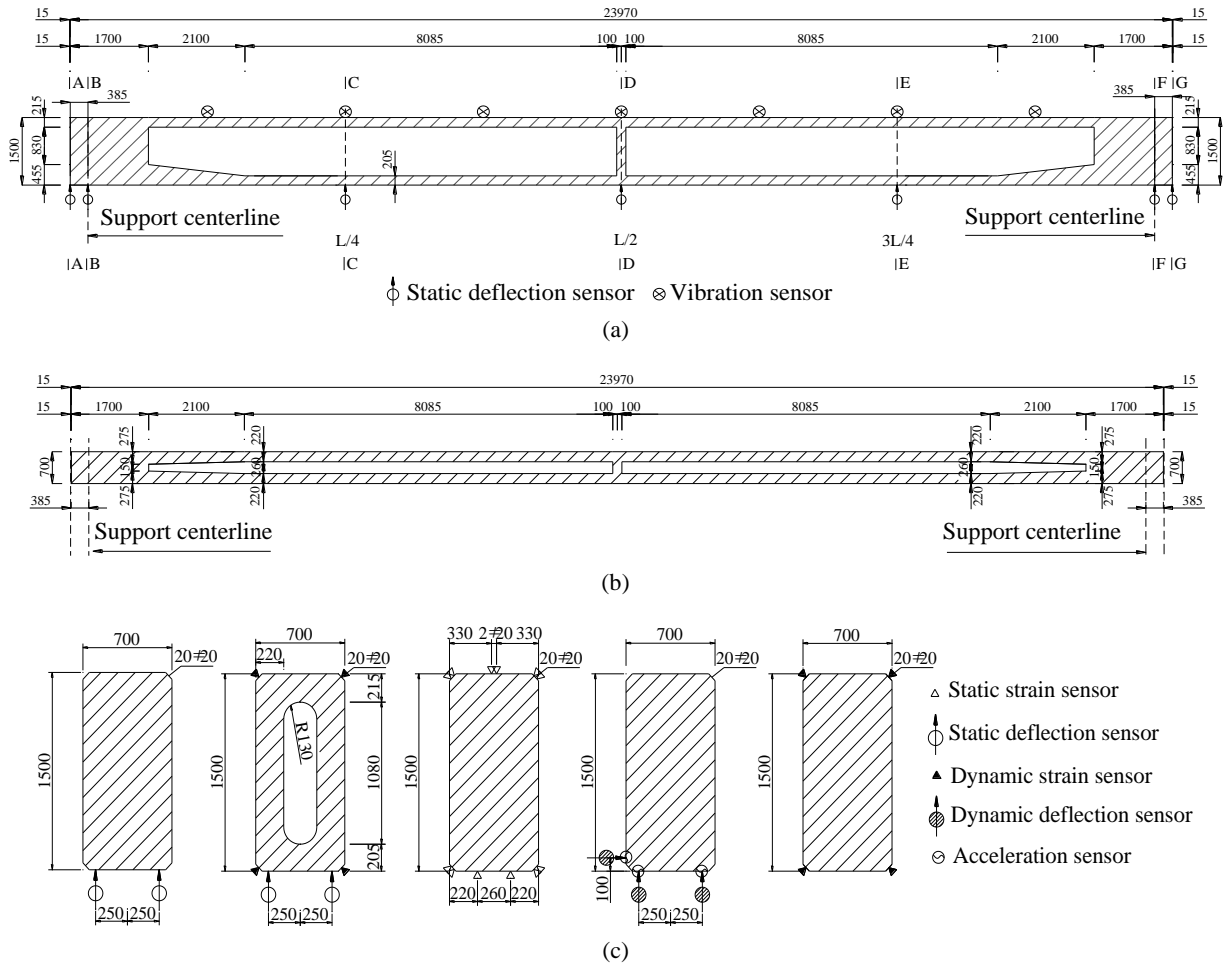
PC track beam (unit: mm): (a) elevation view of TB01; (b) plane view of TB01; (c) static deflection test sections (A-A/B-B/F-F/G-G); (d) static deflection and dynamic strain test sections (C-C and E-E); (e) static strain test section (D-D); (f) dynamic deflection and acceleration test section (D-D); (g) dynamic strain test section (D-D)
